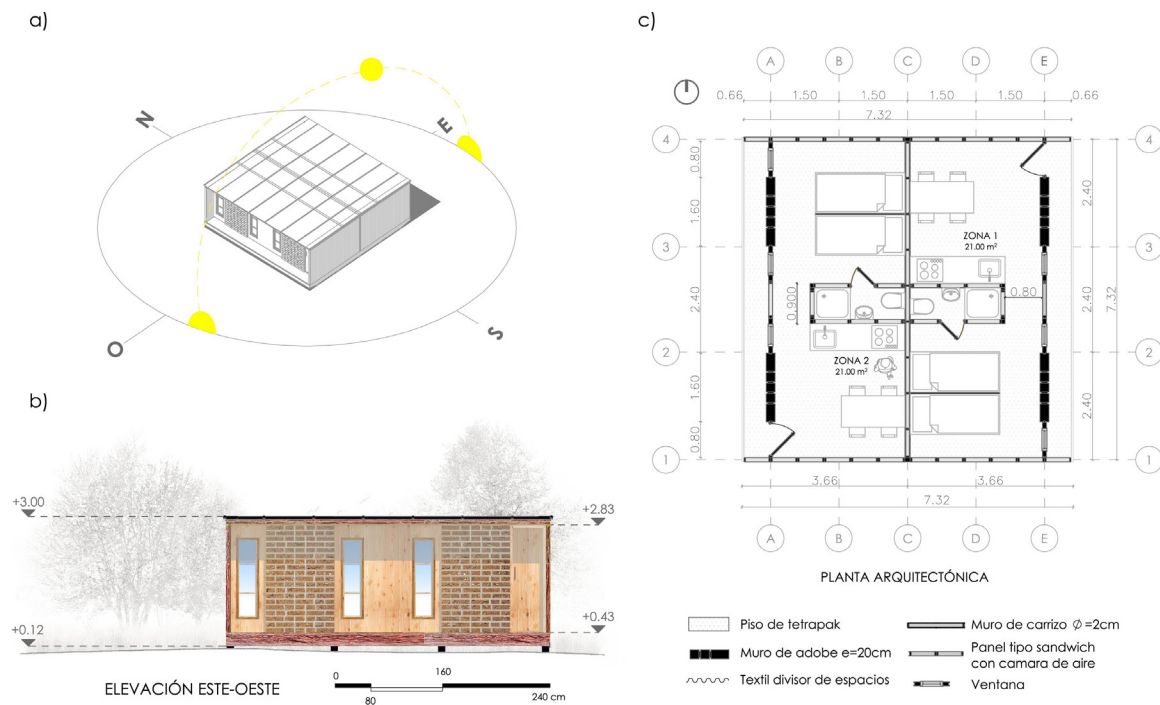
a) volume, b) east-west elevation, and c) architectural floorplan of the model. Source: Preparation by the authors.
